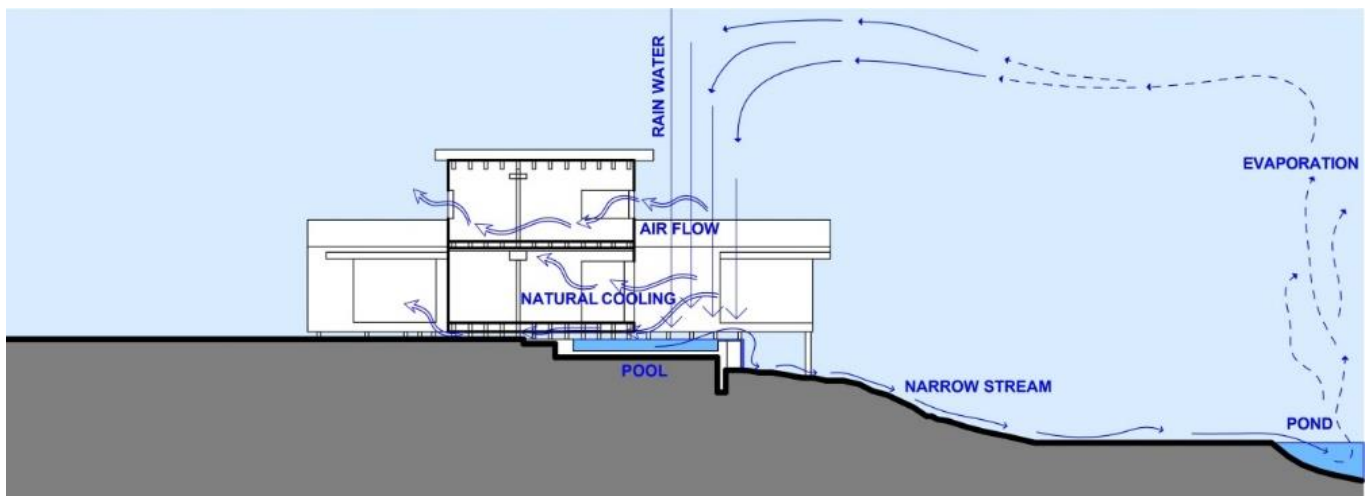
Karuizawa house—public and private area and the pool, plan and views.
